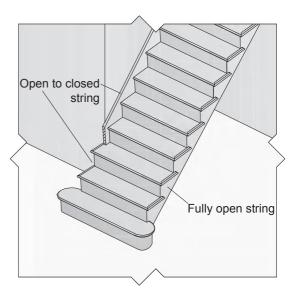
An open-to-closed string can be used where a wall, against which a staircase is fixed, doesn't extend all the way to the foot of the staircase.
